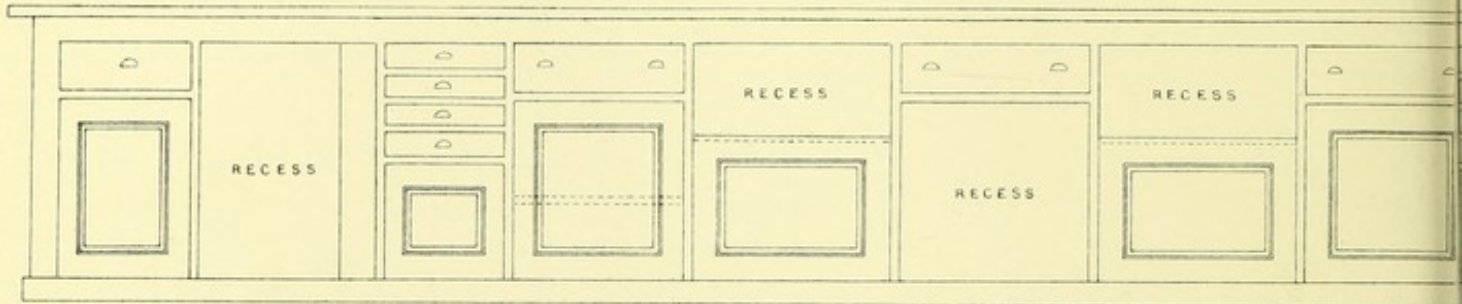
BACK ELEVATION. PITCH PINE FRONTS.
